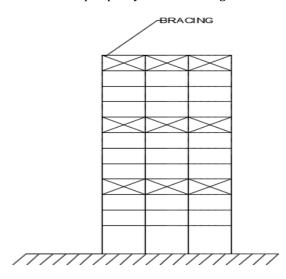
Tall building with belt trusses as "virtual" outriggers
